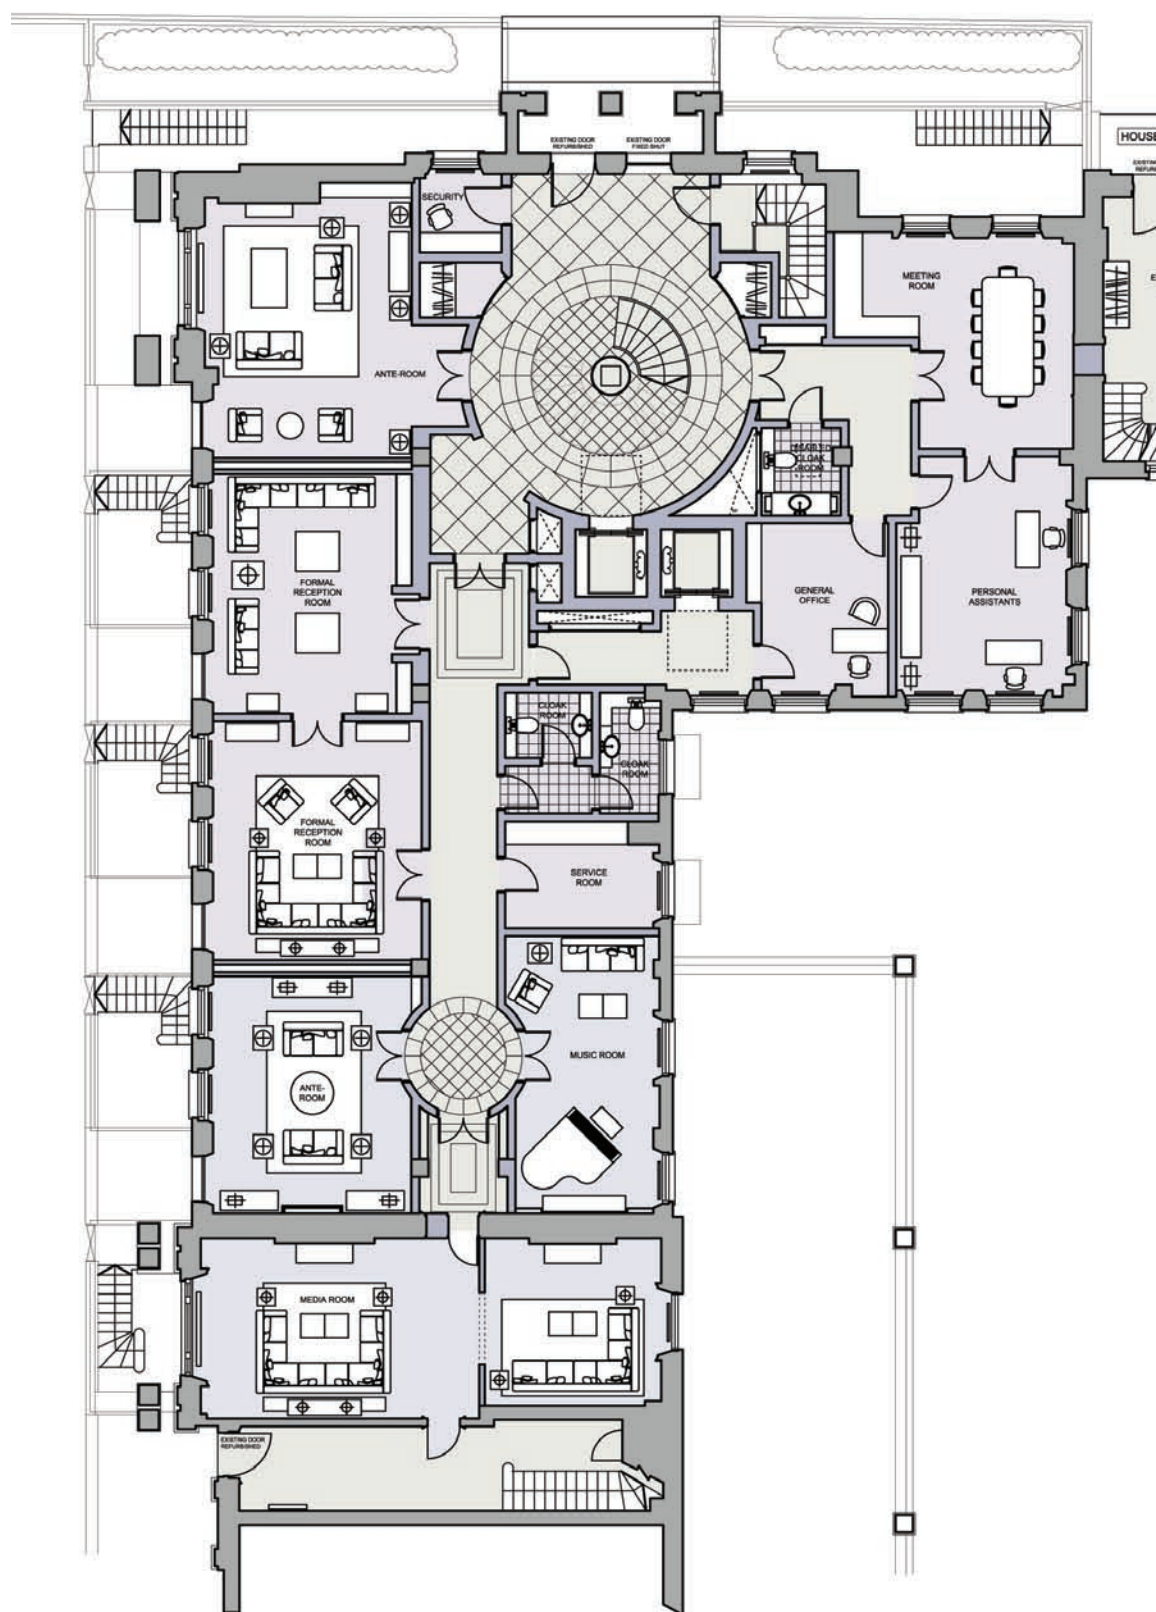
Proposed Ground Floor Layout. 6-10 Cambridge Terrace
